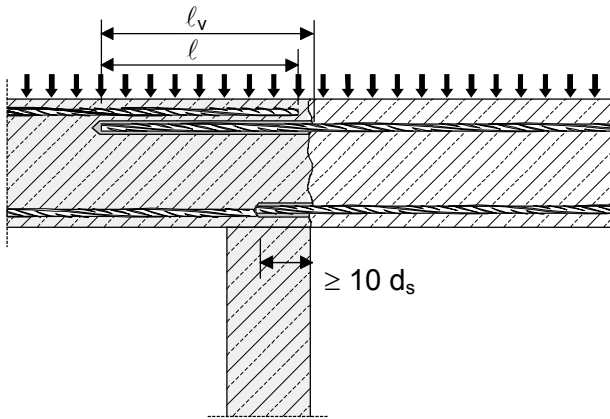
Overlap joint for rebar connections of slabs and beams
